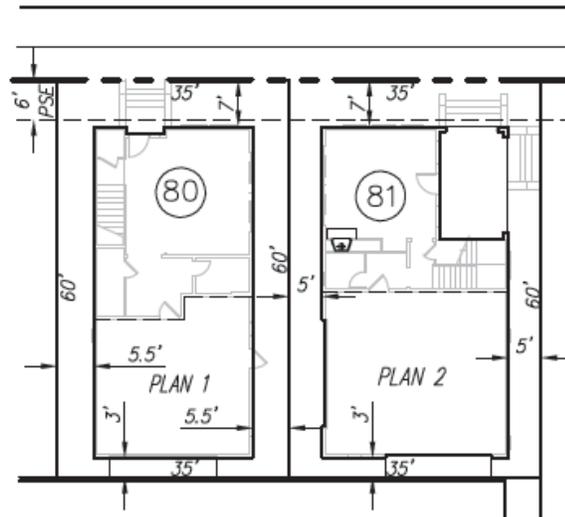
Typical Lot Plan²⁵ for the Three-Story Single Homes.
